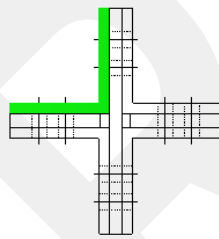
Bending on lower main member 2 (Specimen-3)
